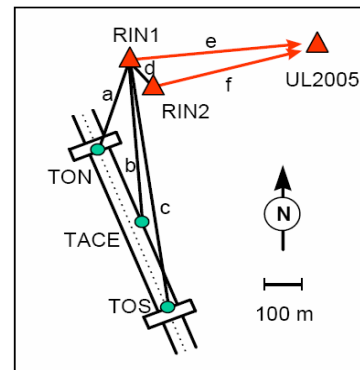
Pierre-Laporte Bridge, near Quebec City, Canada
